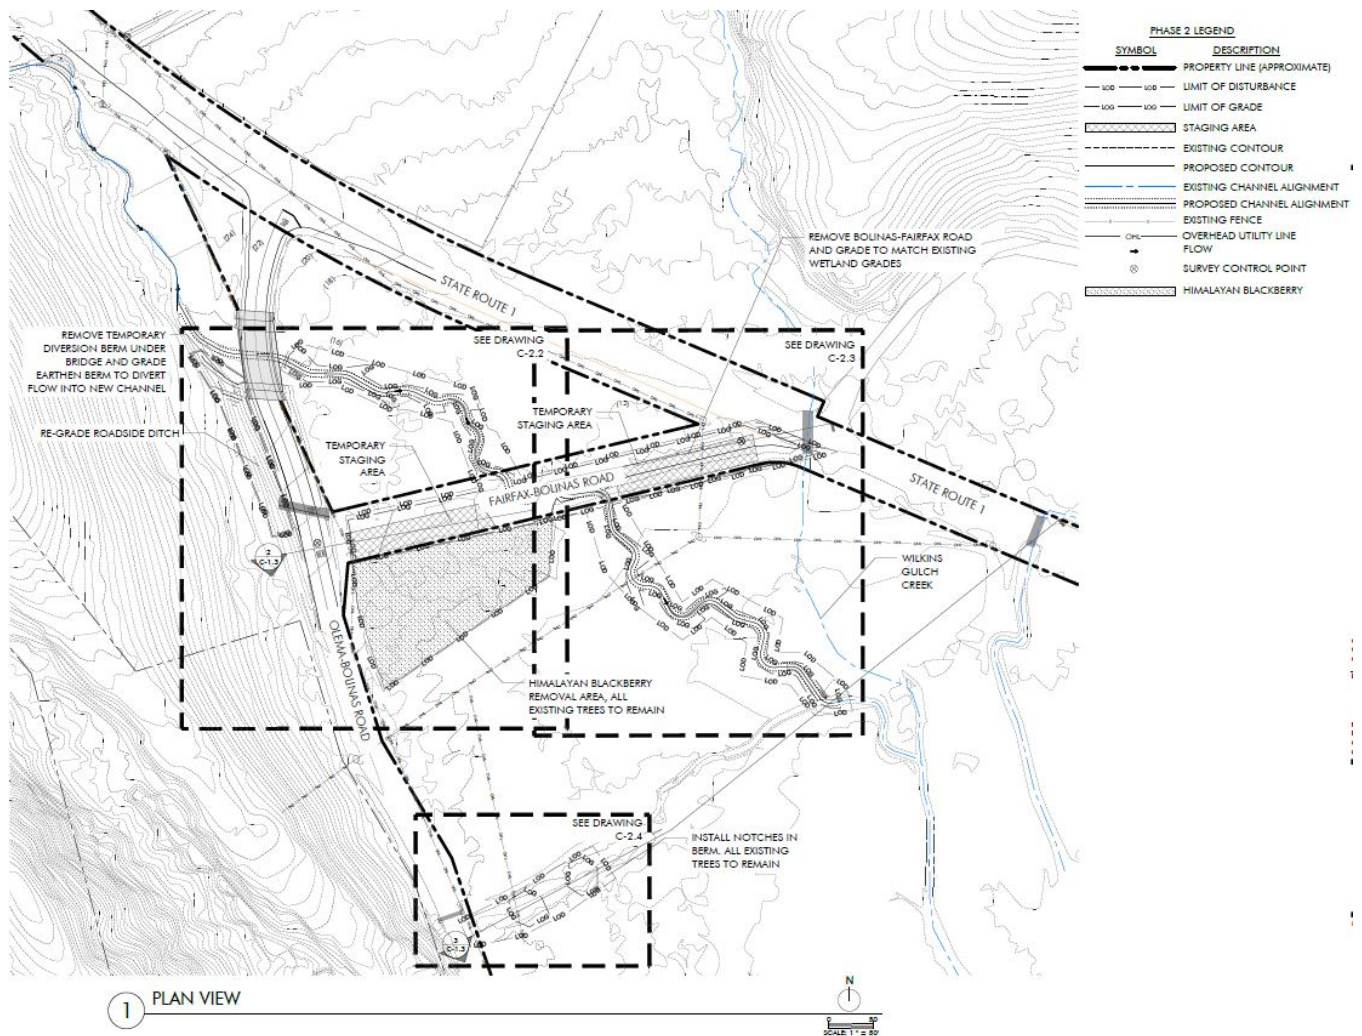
Bolinas Lagoon Wye, Year 2 Construction Elements, Sheet C-1.0
